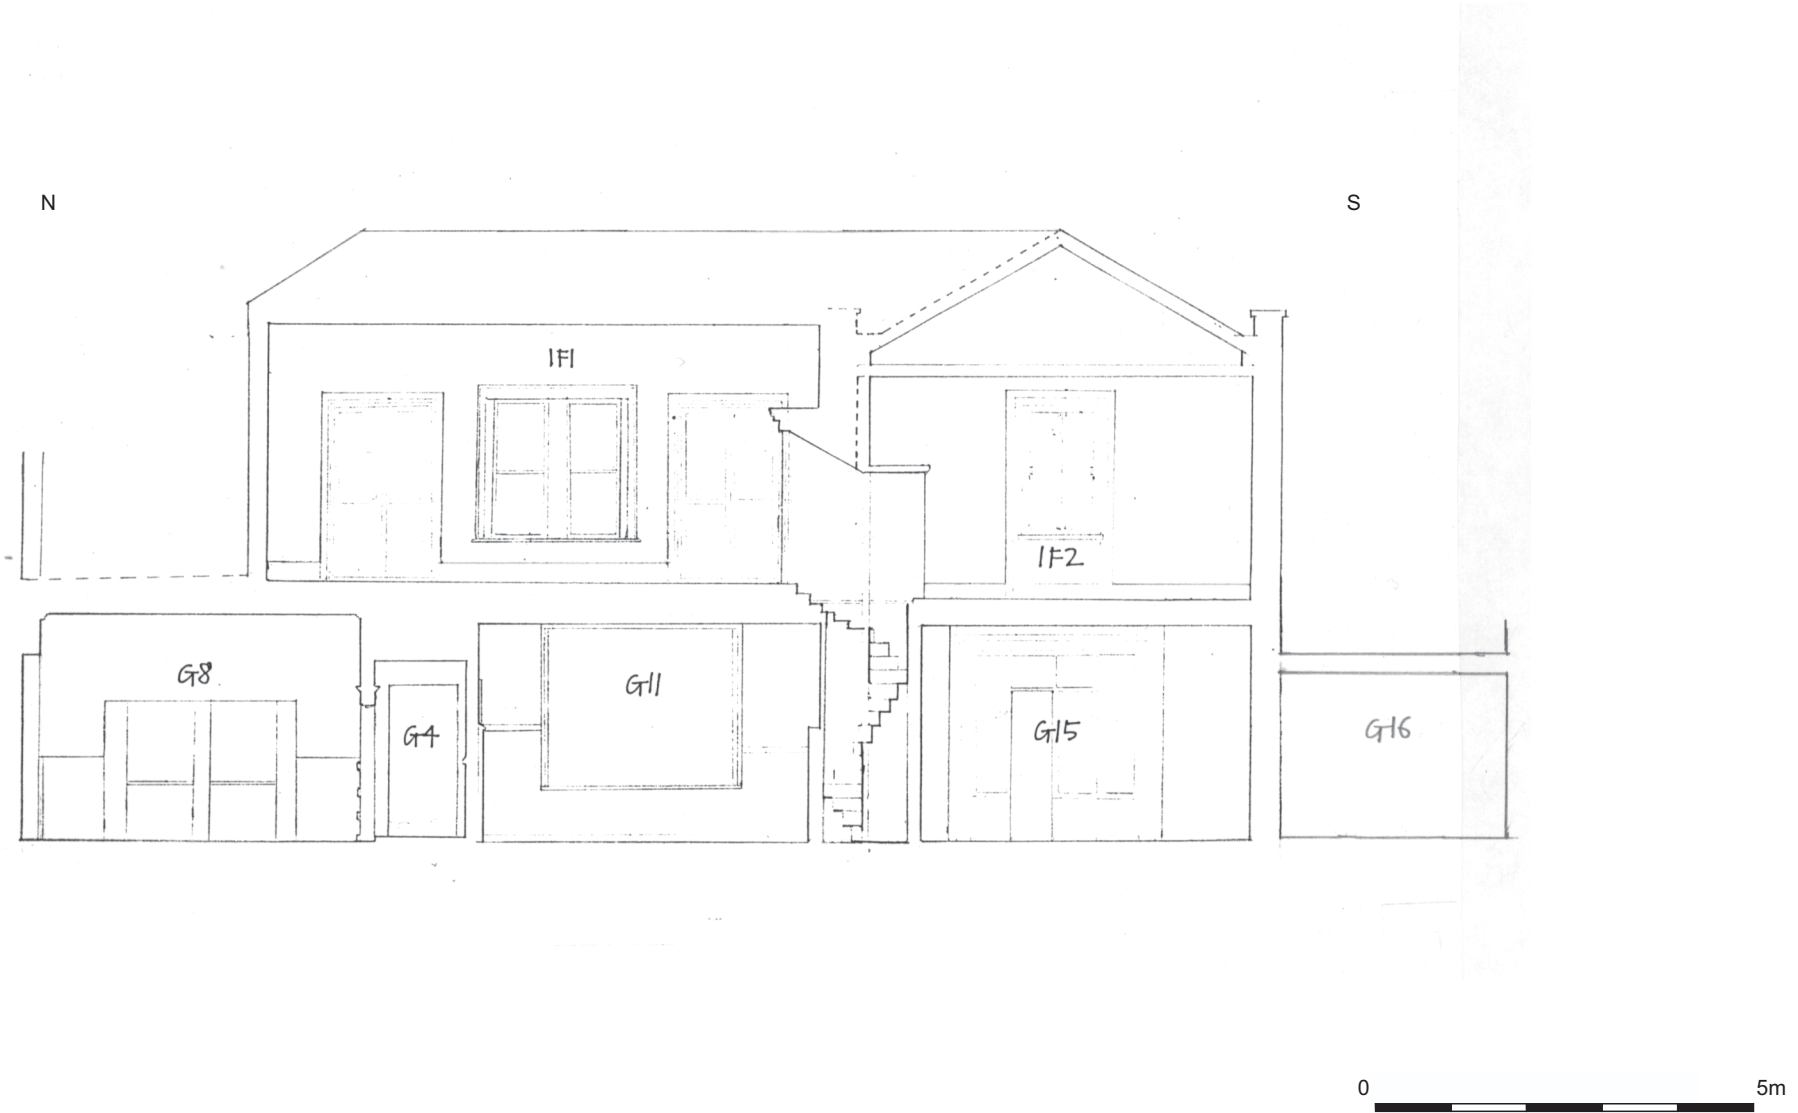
Sectional elevation north-south through the eastern half of the standing building
